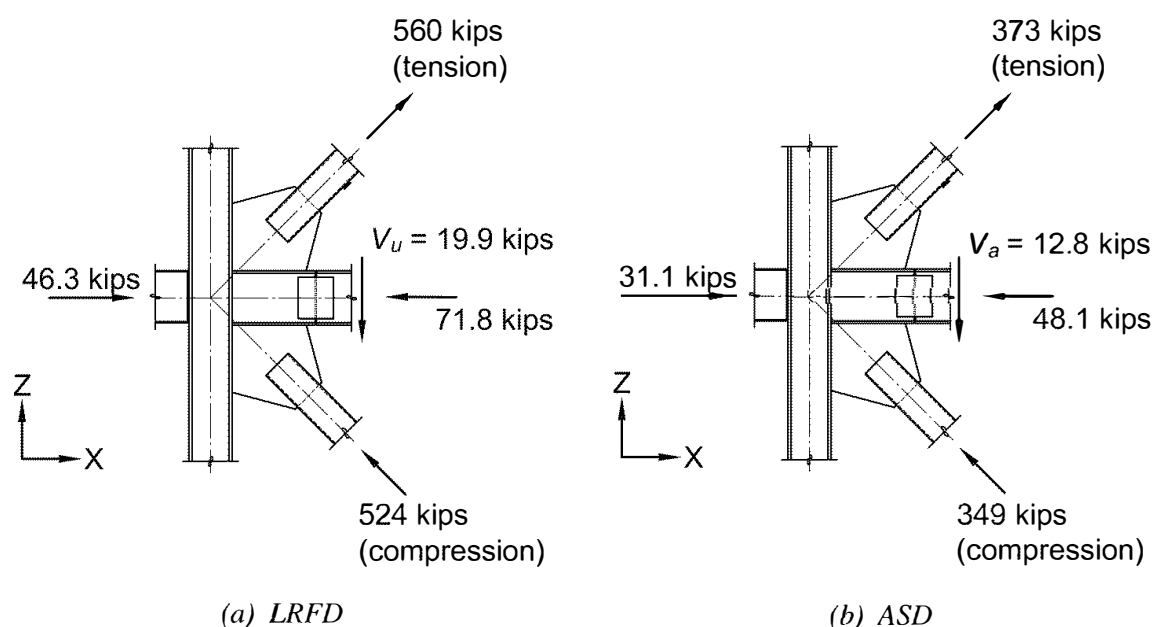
Required strength of brace connections according to AISC Seismic Provisions Section F2.3(a) for Design Case I.
